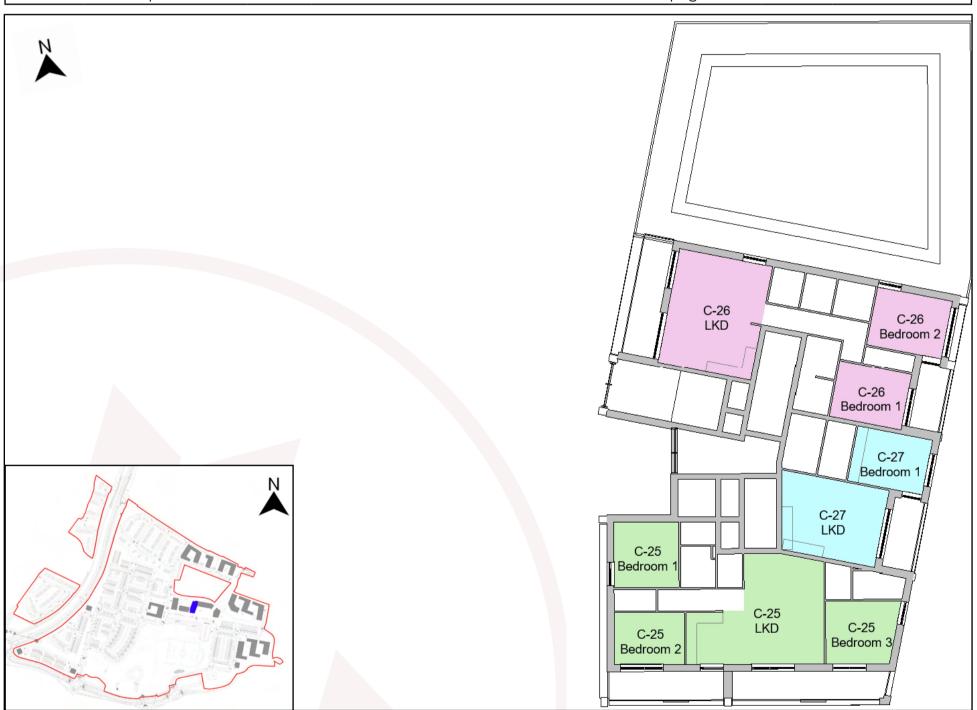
Keyplan highlighting the assessed building (L), Floor plan of assessed building (R).
